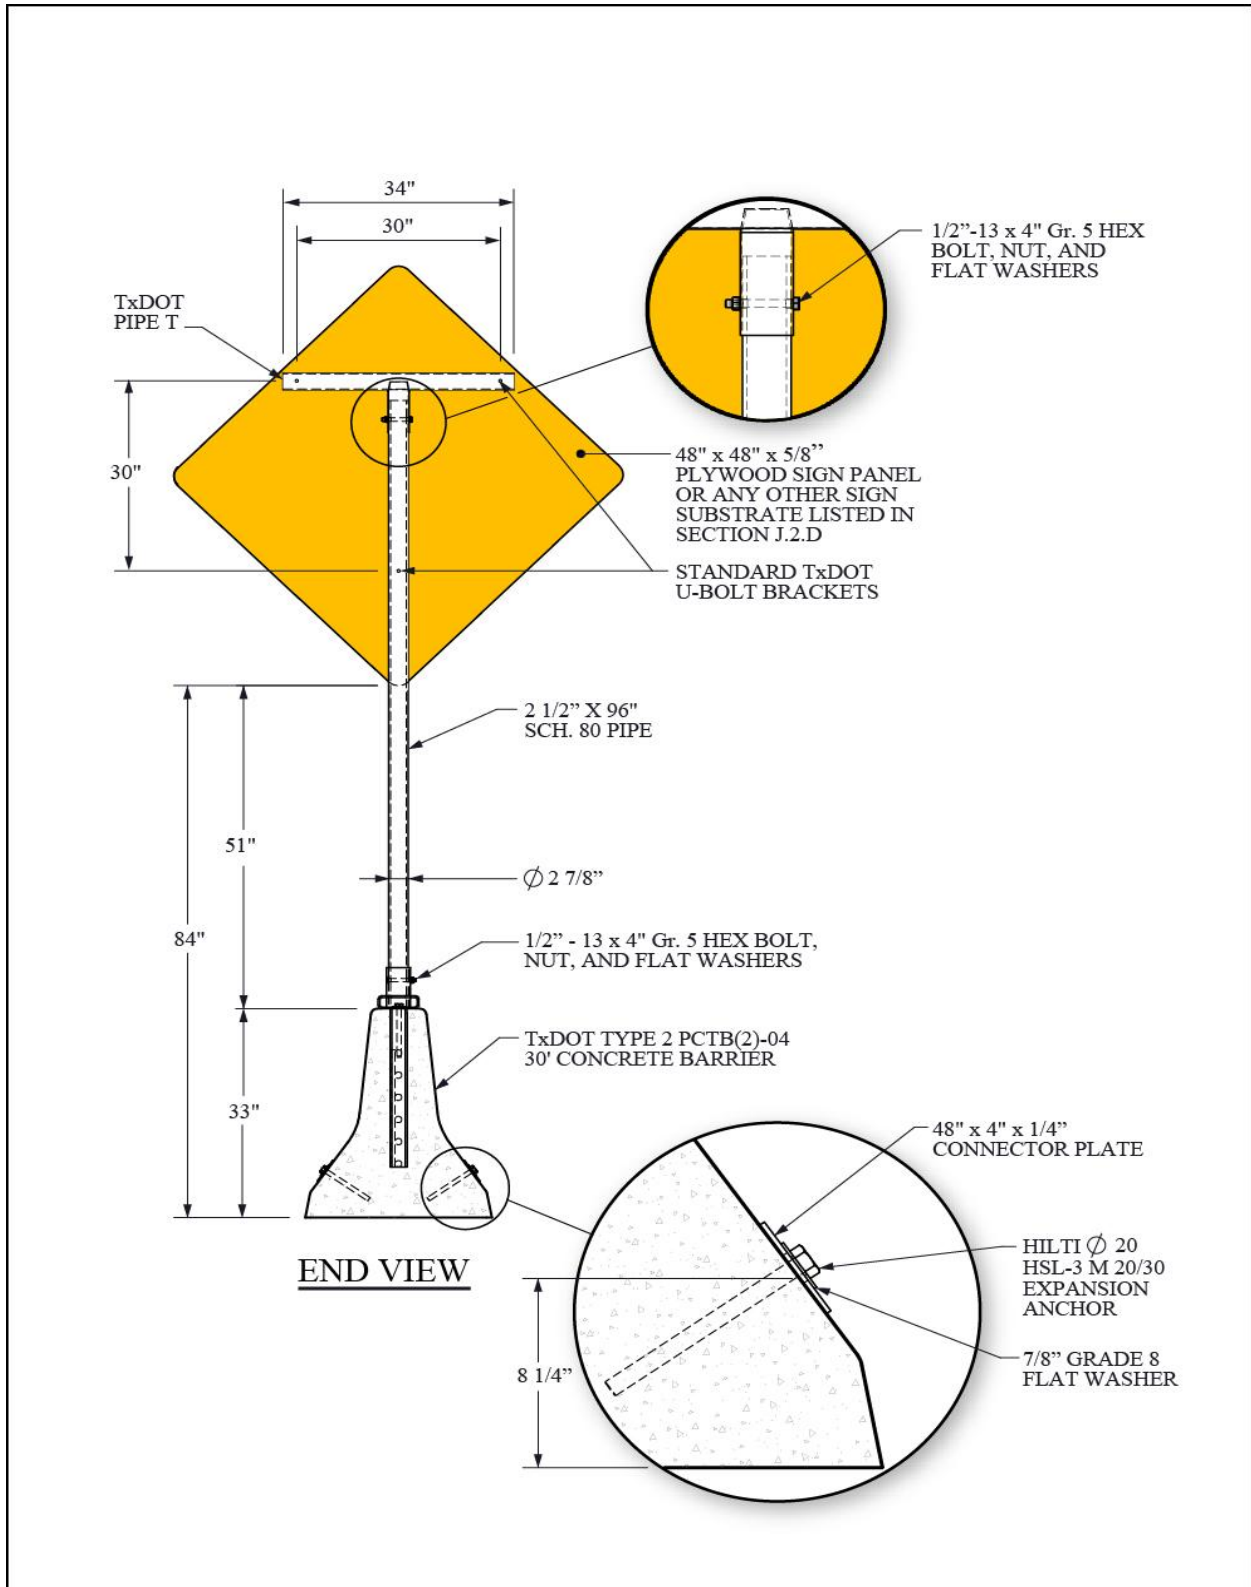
Figure Appendix A-1. Type 2 Portable Concrete Traffic Barrier (PCTB) Sign Support Assembly (2 of 4)
